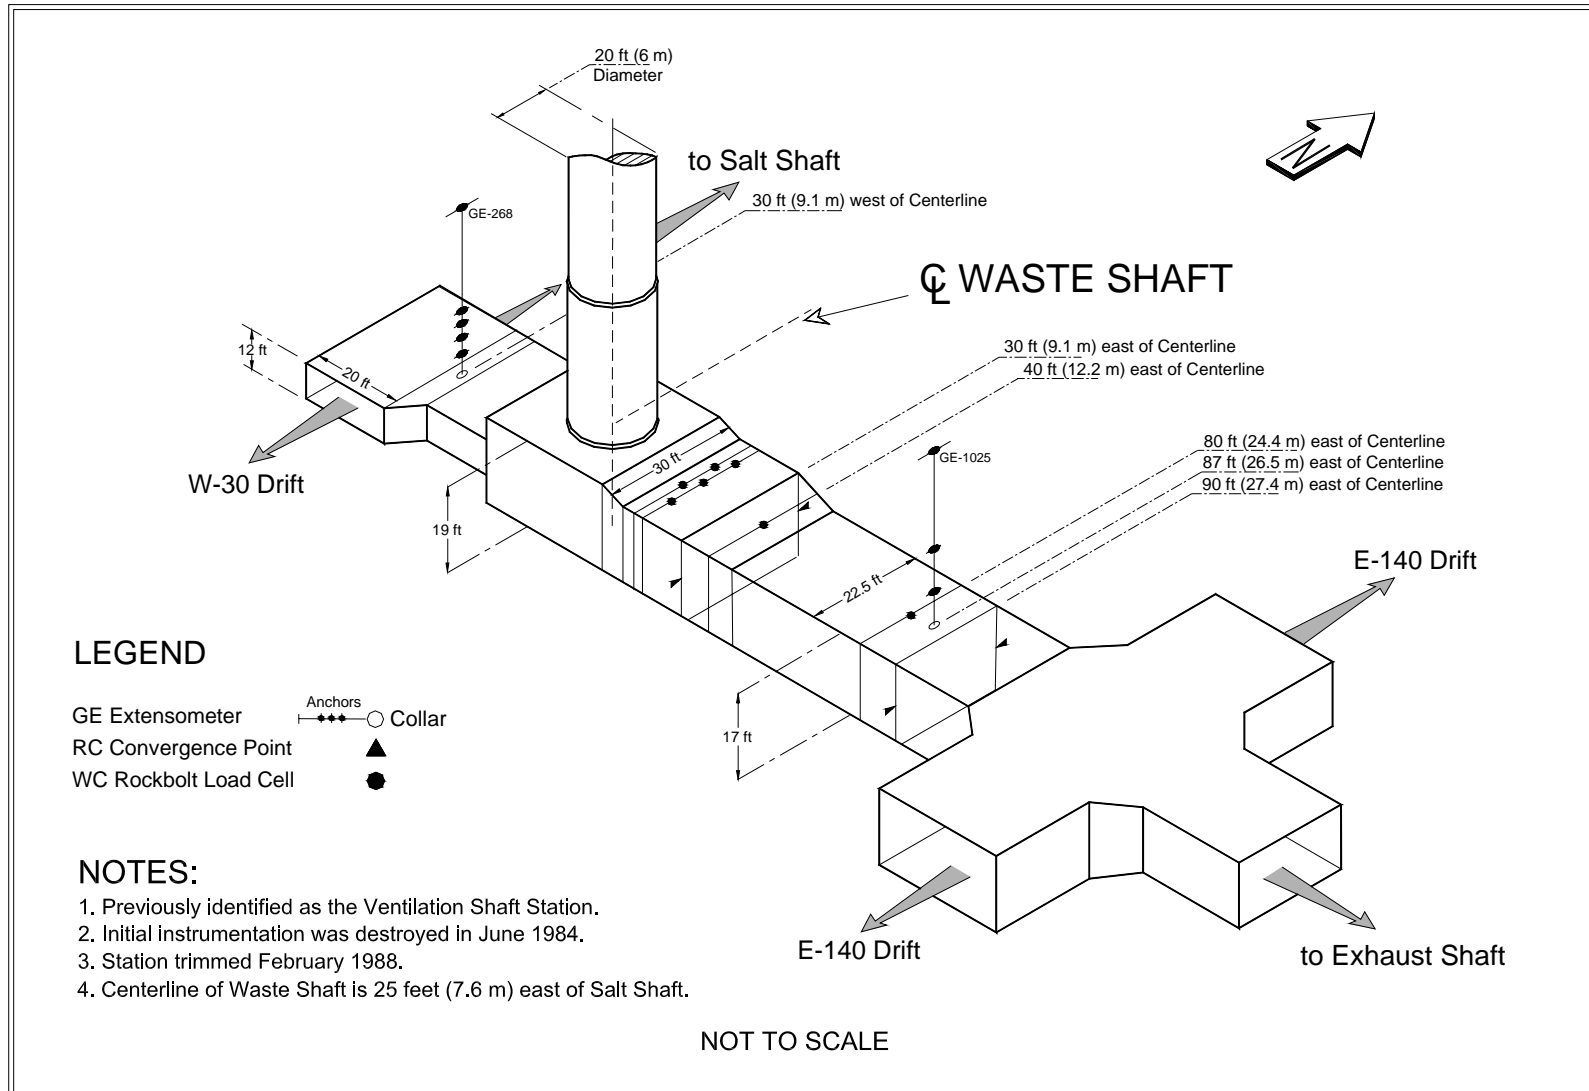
Waste Shaft Station Instrumentation after Wall Trimming
